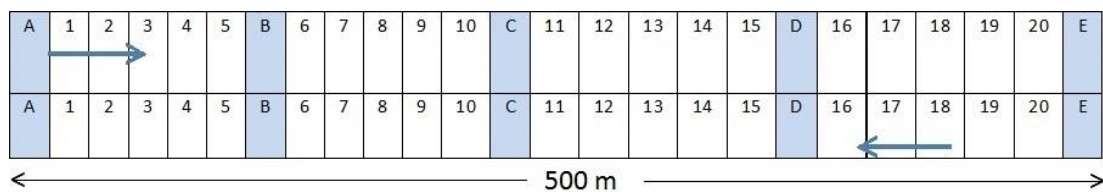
Layout of LTPP sections on Agostinho Neto
